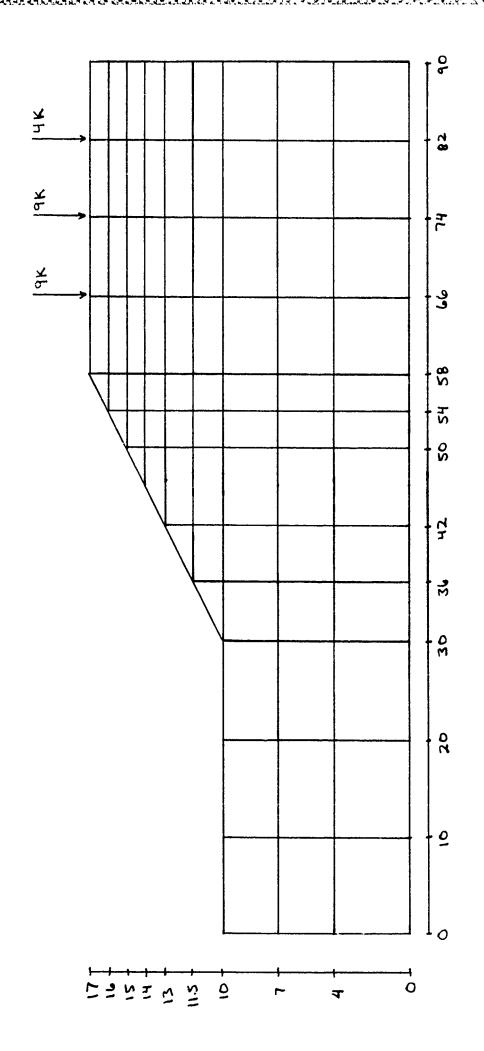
SSTIPN EMBANKMENT GEOMETRY
